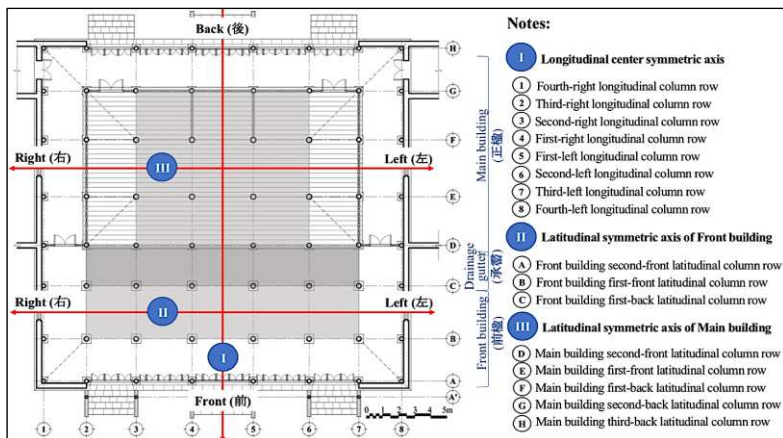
Axes and column rows of the twin buildings shown on the floor-plan
